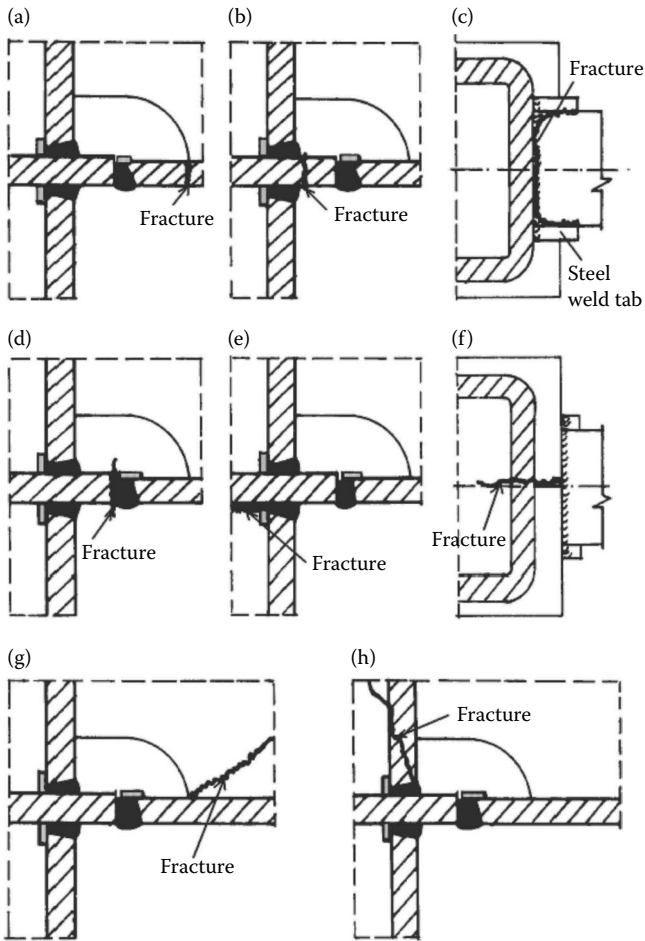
Typical connection fractures. (Gioncu, V., Mazzolani, F.M. 2002: *Ductility of Seismic Resistant Steel Structures*. Spon Press, London; after JSSS, 1997: Kobe earthquake damage to steel moment connections and suggested improvement. Technical report, No. 39.)
